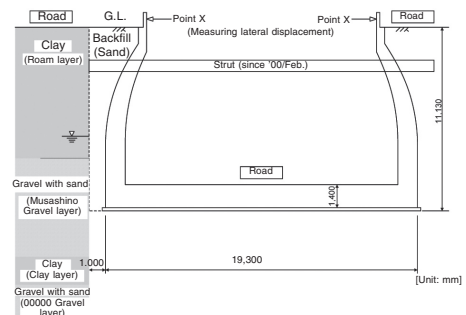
Cross-section of the RC U-shaped soil retaining wall (Sumiyoshi, 2005)
